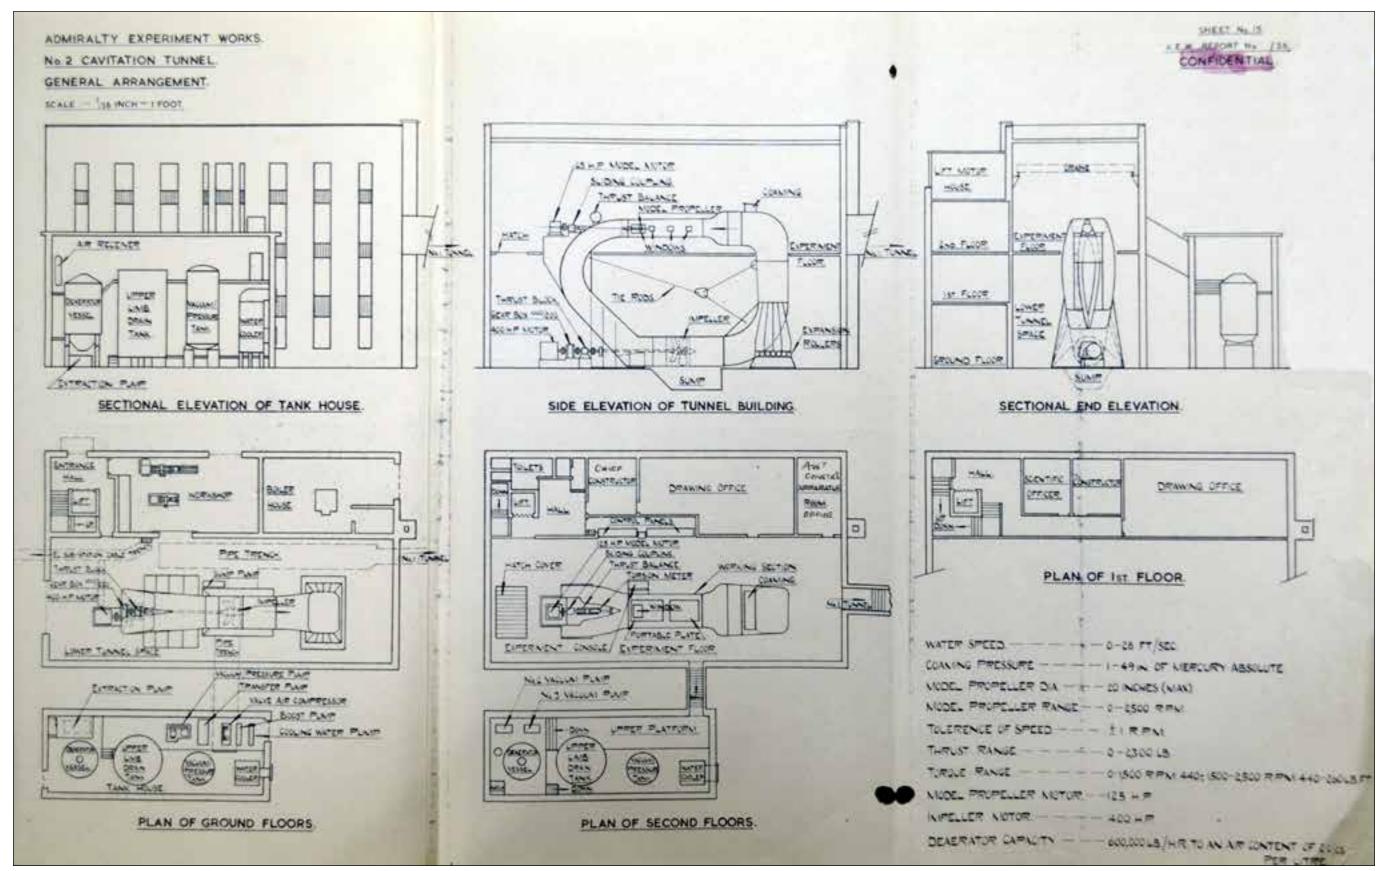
Plan and elevation drawings from 1958 of Buildings 46 & 47 showing the internal arrangement of No 2 Cavitation Tunnel (TNA ADM 226/644)
